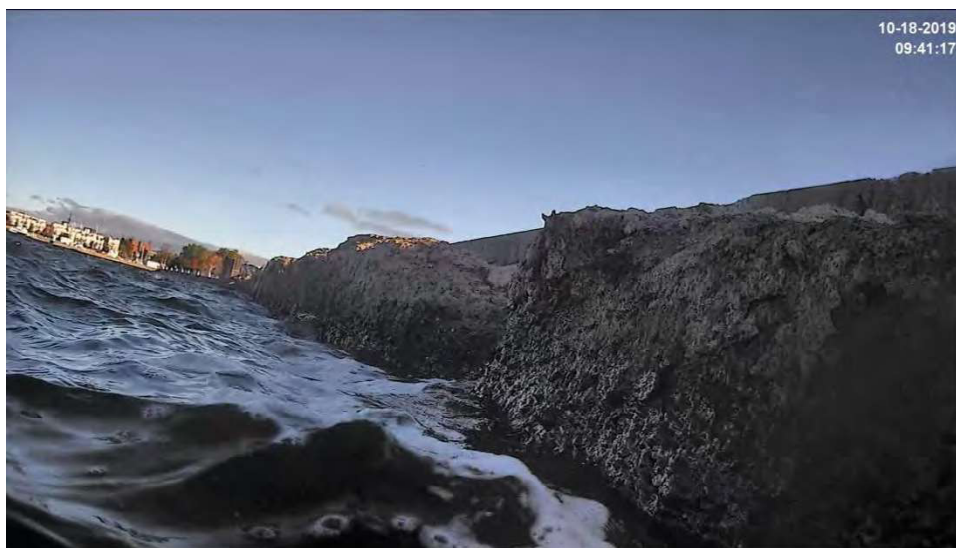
East Breakwater West Face - Spawling in Cap 0+97 North
